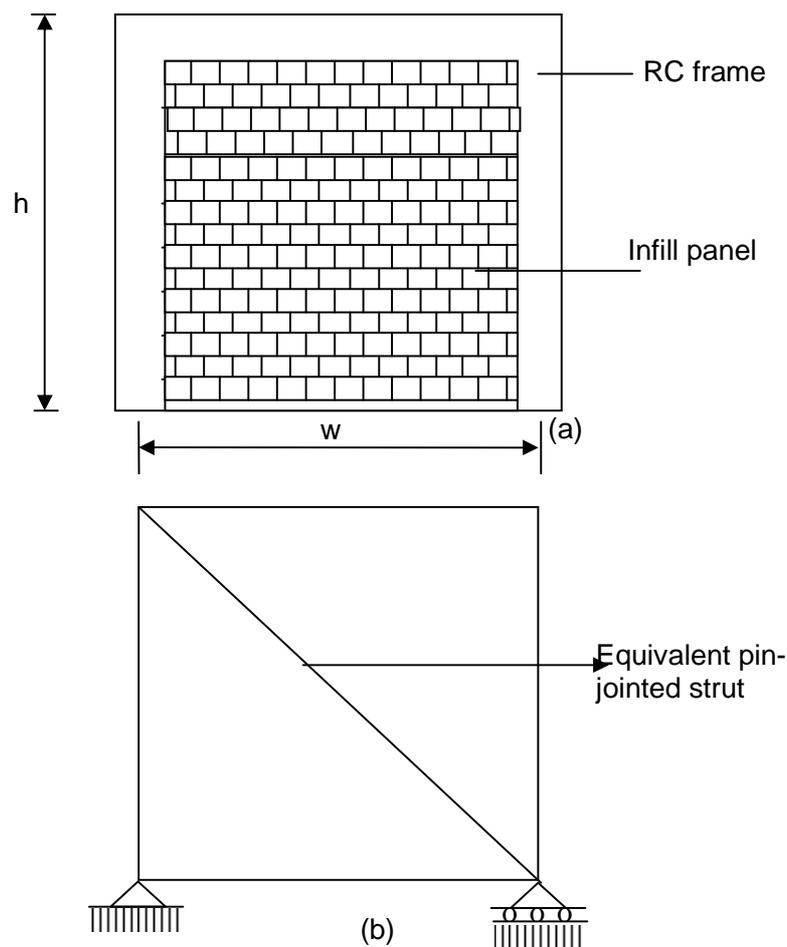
(a) infilled reinforced concrete frame (b) equivalent one-strut, macro-model
